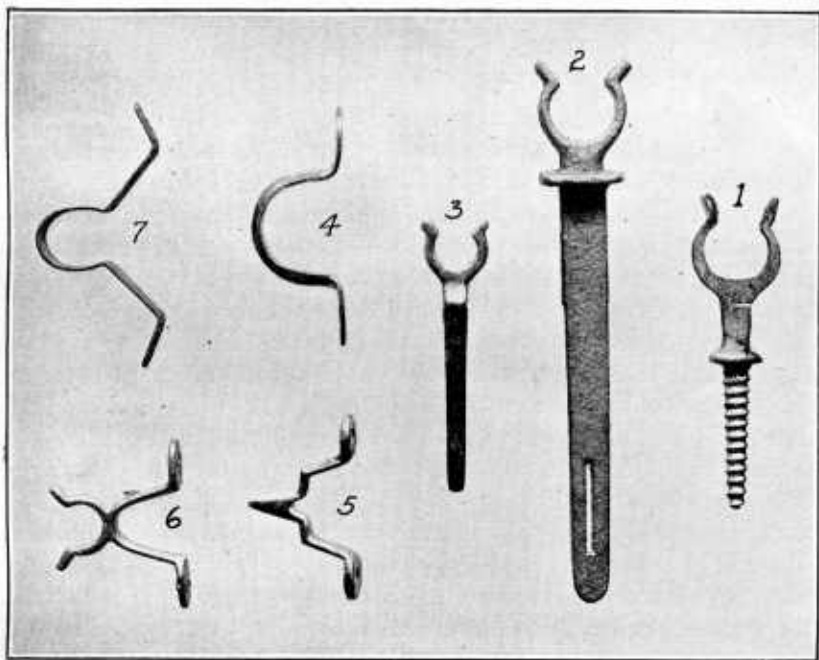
Fasteners for securing conductors to buildings. 1. One-piece screw fastener for cable or star-section rod. 2 and 3. Fasteners for use in brick, concrete, and tile walls while building is being constructed. 4. Clip or strap for pipe or rod conductors. 4. Fastener for star-section rod laid on surface of building. 6. "Dispenser" attachment for cable. 7. Loop attachment for star-section rod.
